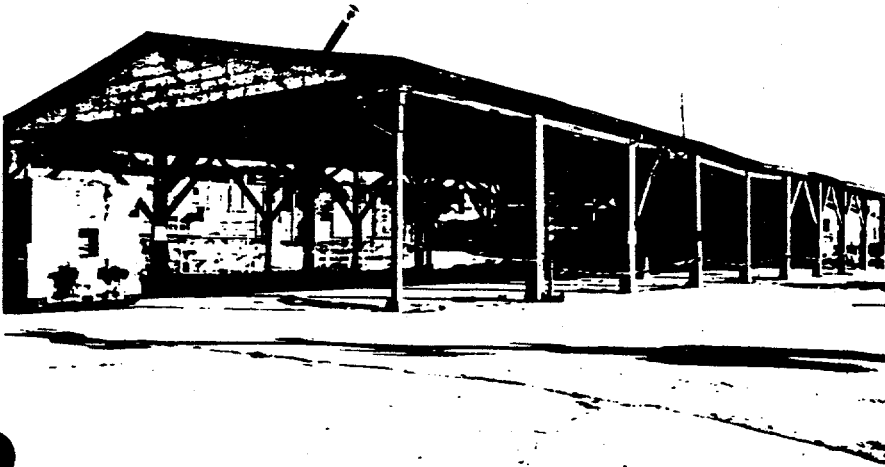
View 7 - Interior. Rafter and support structure configuration of the Building 81-10 roof.
